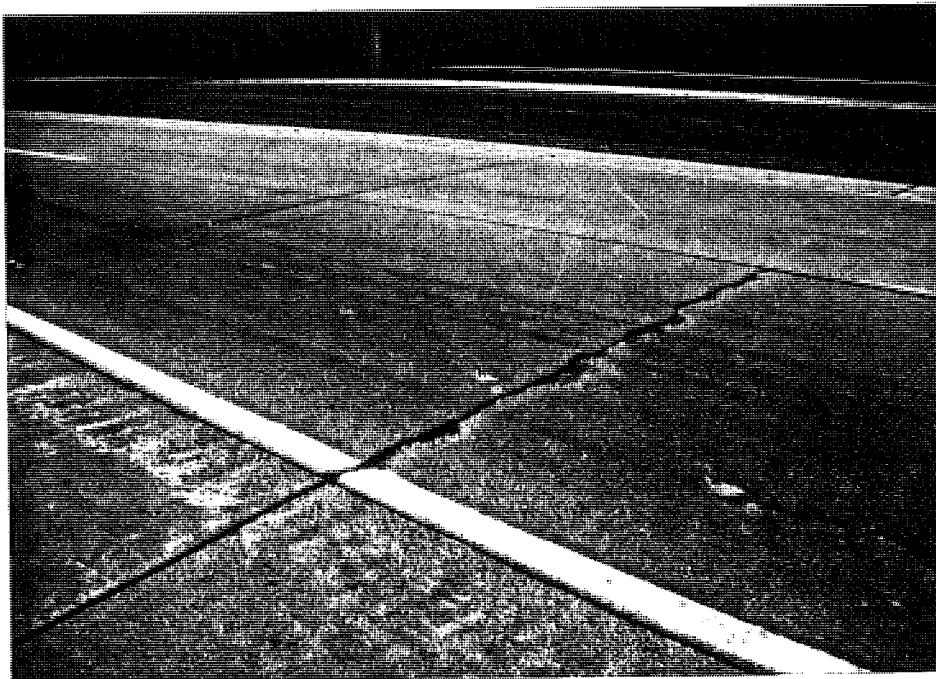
Typical crack pattern in section MI1-1, peastone concrete on open-graded drainage course.
